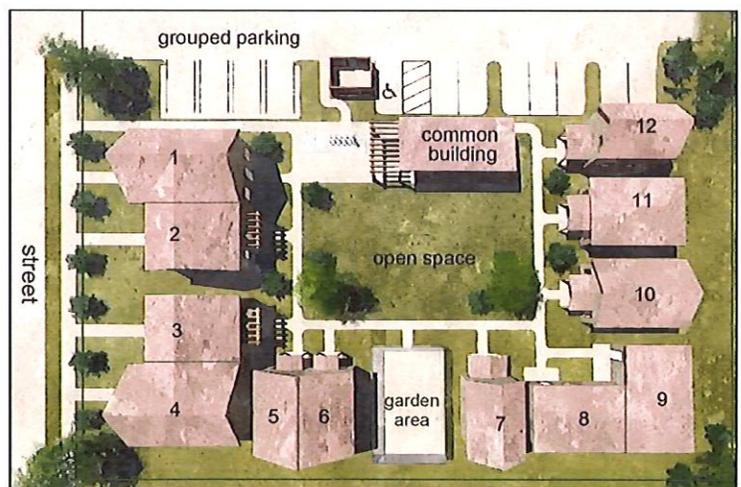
Cottage Housing Conceptual Site Plans
